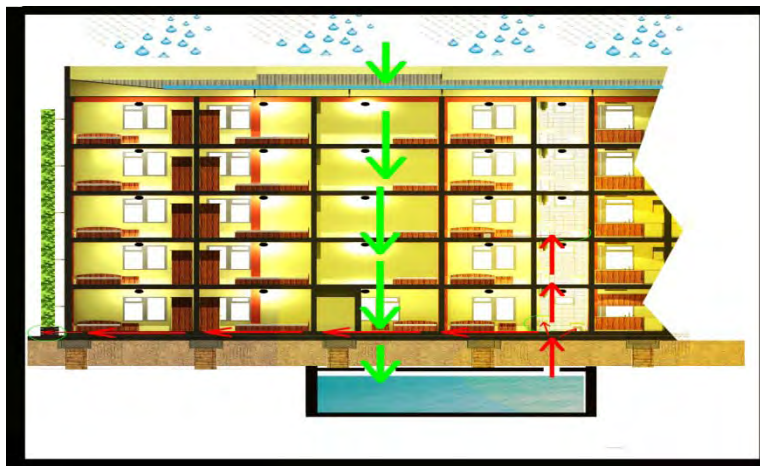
A vertical greening design proposal for condominium buildings (design by author)
